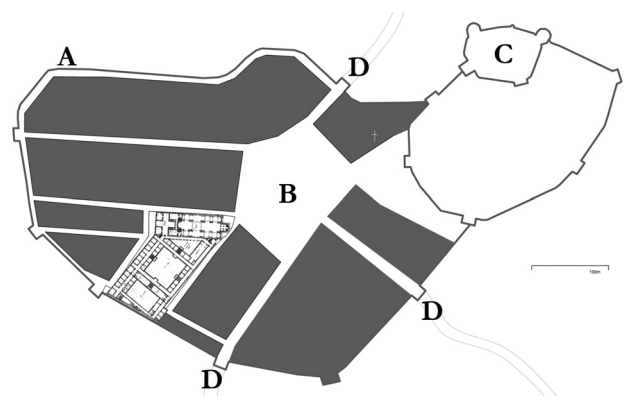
Plan of Ostroh with Briano's second design for college A – city walls, B – town market, C – castle D – main town gates [K. Kantorowicz]
